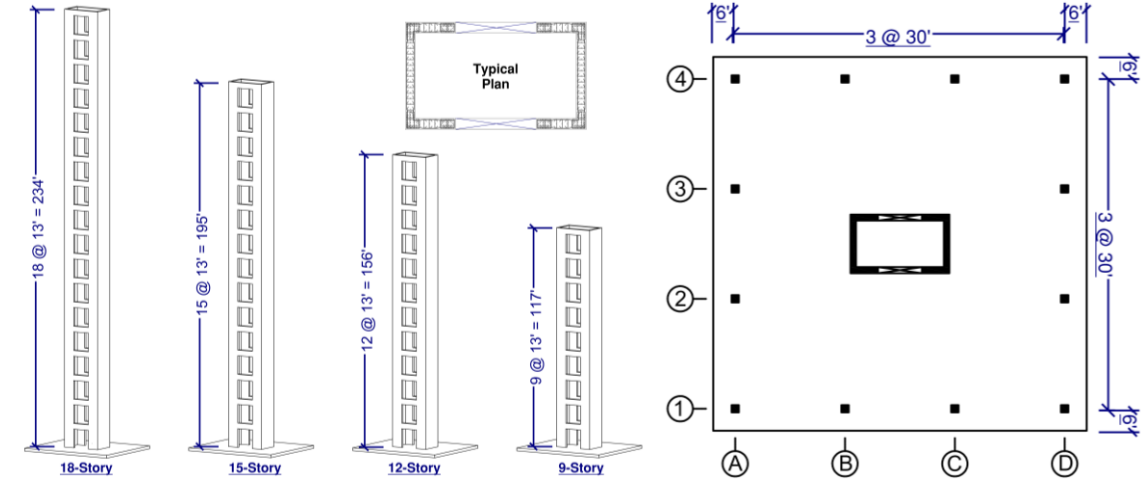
typical archetypes floor plan and its isolated core wall 3-dimensional view.
